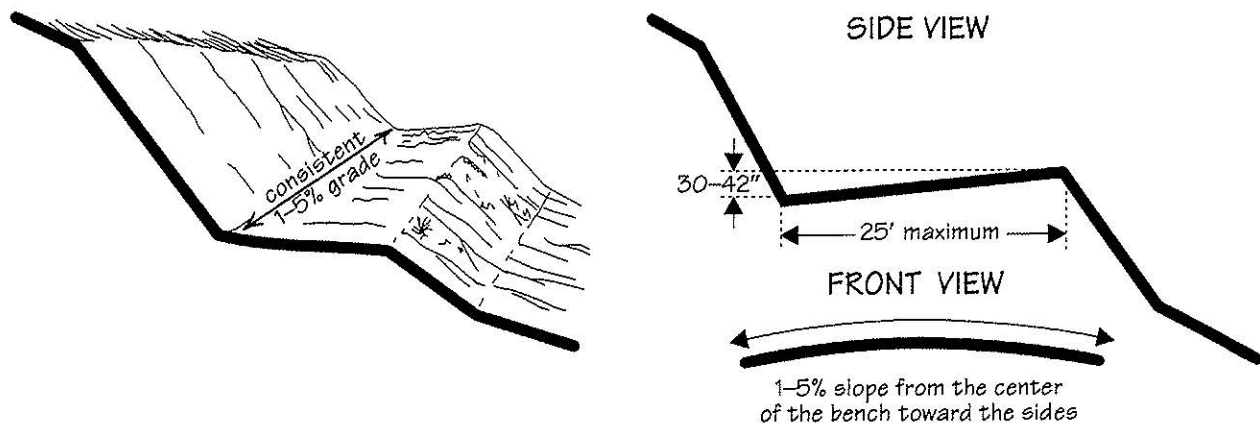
Benching and terracing of unconsolidated material to control runoff. Benches cut in overburden or other material likely to erode should be sloped into the hillside (side view) and away from the center of the bench (1–5% slope or grade) to allow drainage to either side (front view). (Modified from Law, 1984. Copyright © 1984 by Van Nostrand Reinhold Company Inc. Used by permission of the publisher.)
